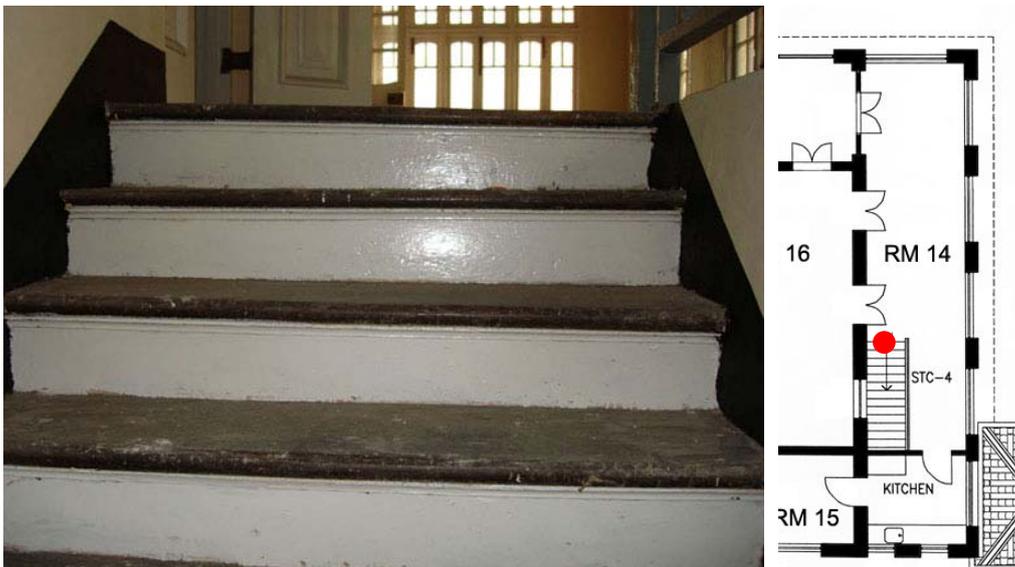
Close up of the treads and risers of the timber staircase (STC – 4) at the main building.
